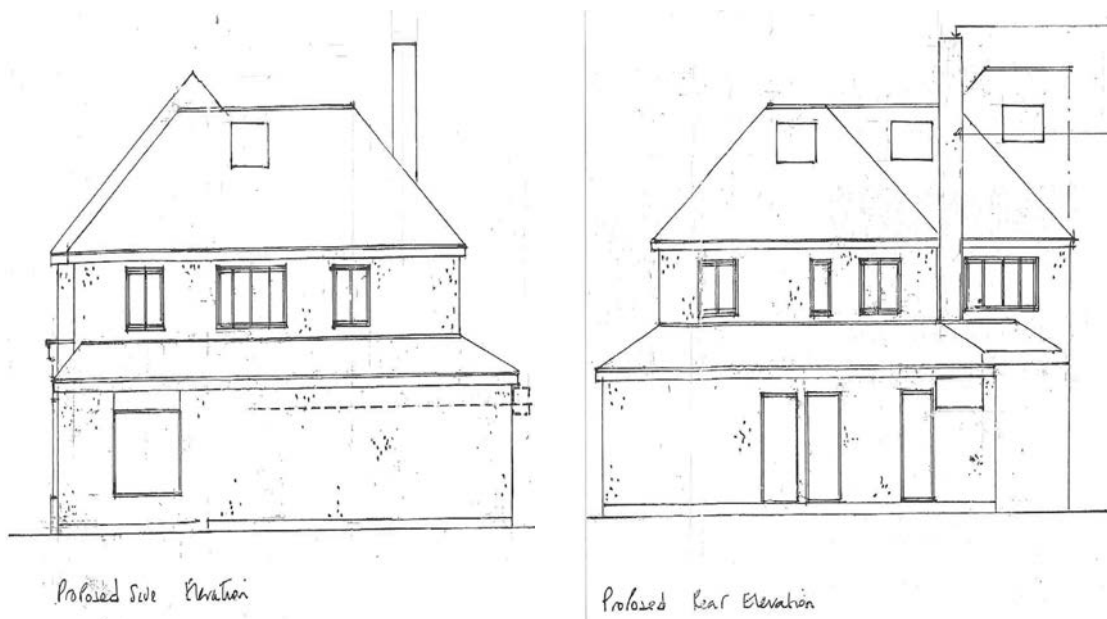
Approved side and rear elevations to No. 124 Billesley Lane
